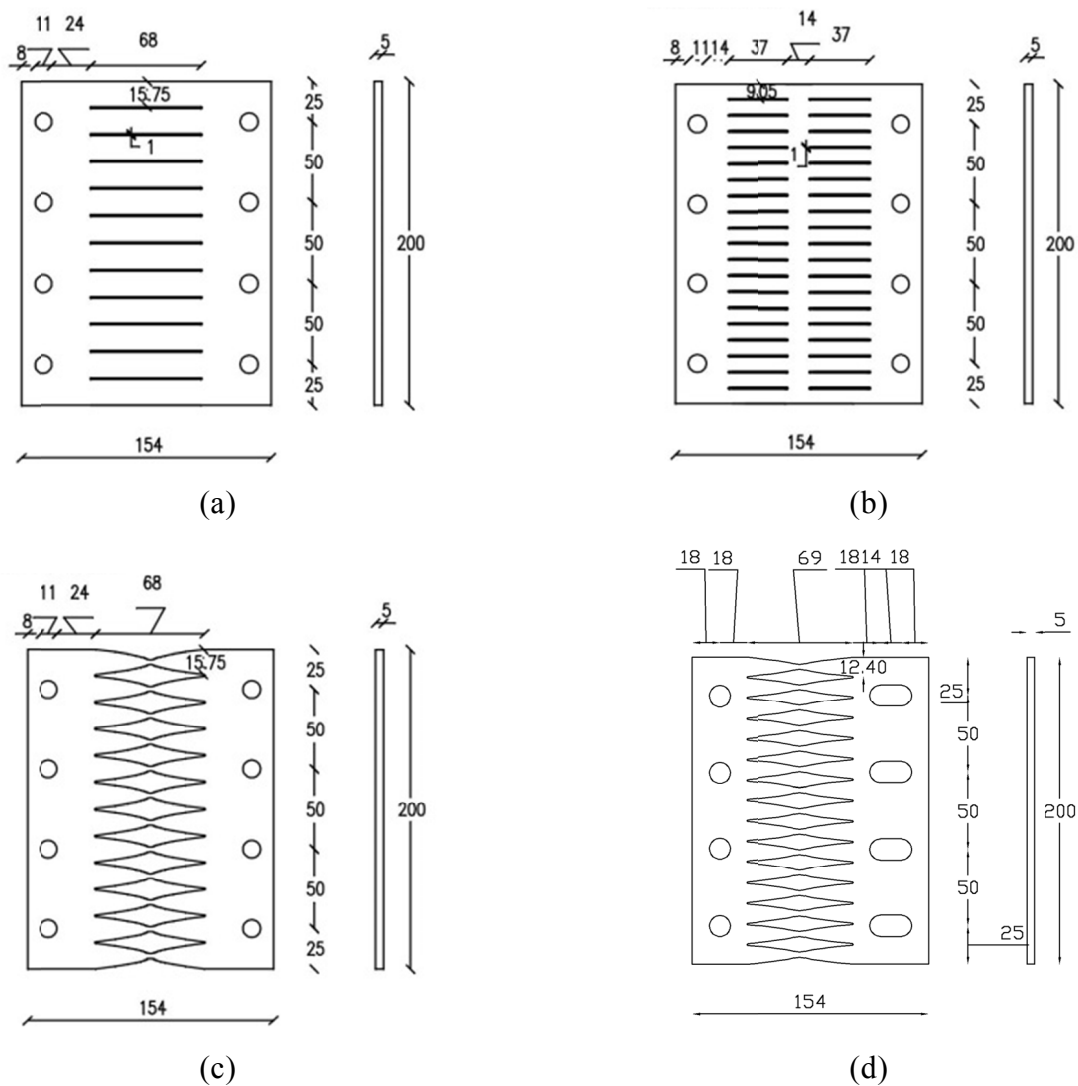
Multiple slit connection devices tested devices: (a) single column, (b) double column, (c) hourglass, (d) hourglass with horizontal slots
